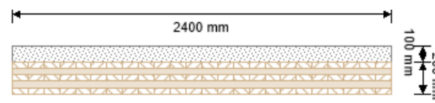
Cross-section of TCC floors used in the DPG mediavaert building [72]
